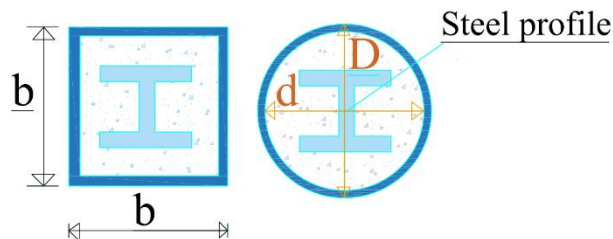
Circular and square cross-section layout with steel profile embedded.
